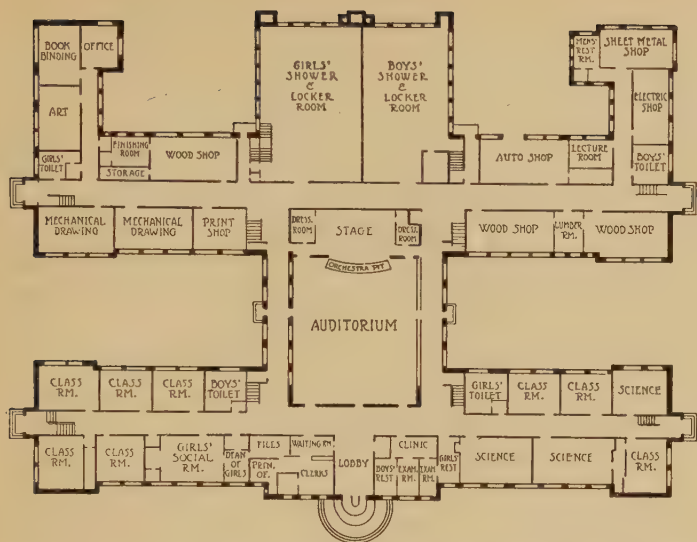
First-floor plan, Carlos M. Cole Junior High School, Denver
